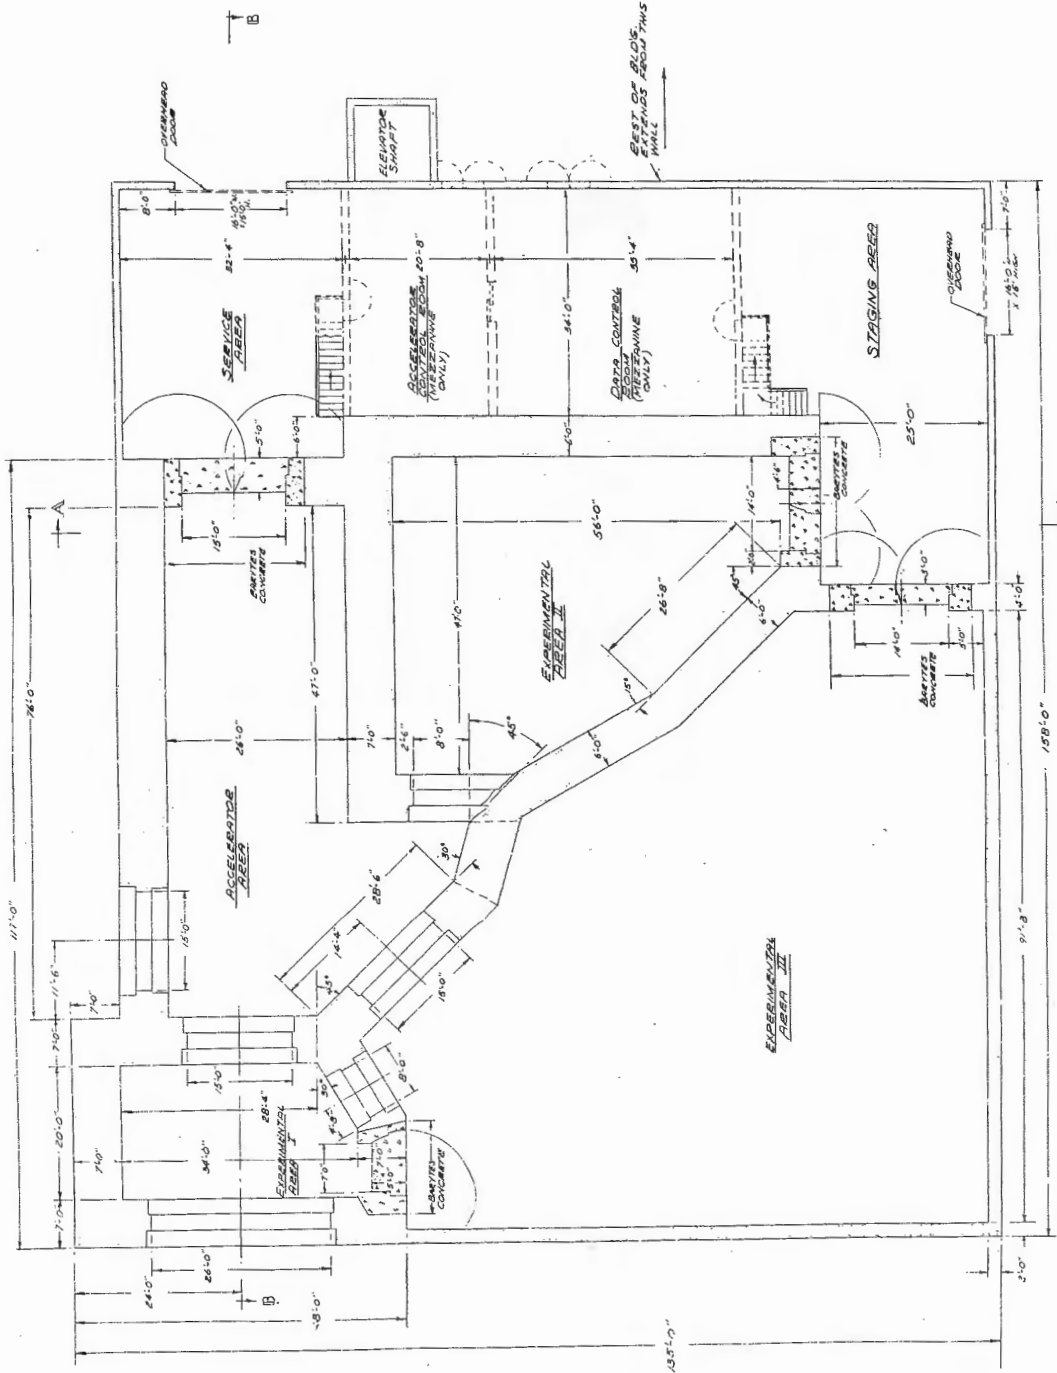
First floor and mezzanine of experimental wing, section through 4-ft level.
